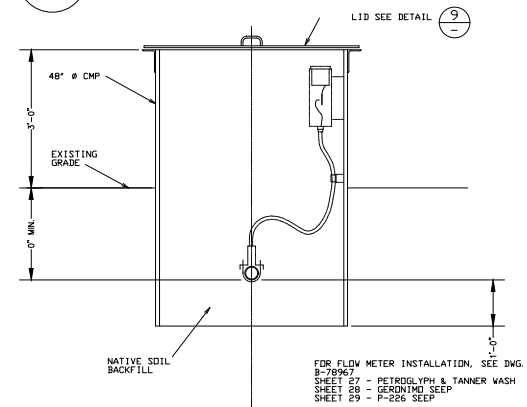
TYPICAL CMP LID ATTACHMENT
